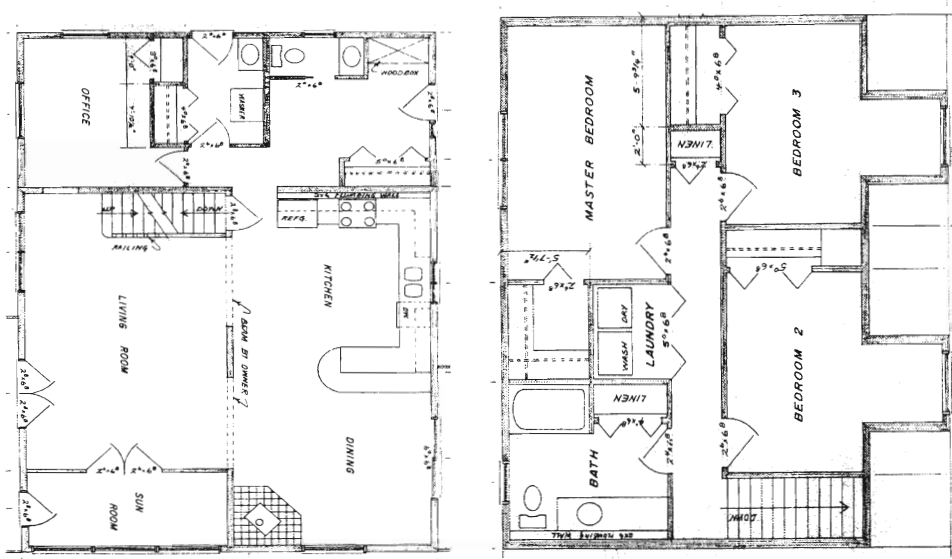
First and second floor plans of Wieberdink-Blankvoort home
